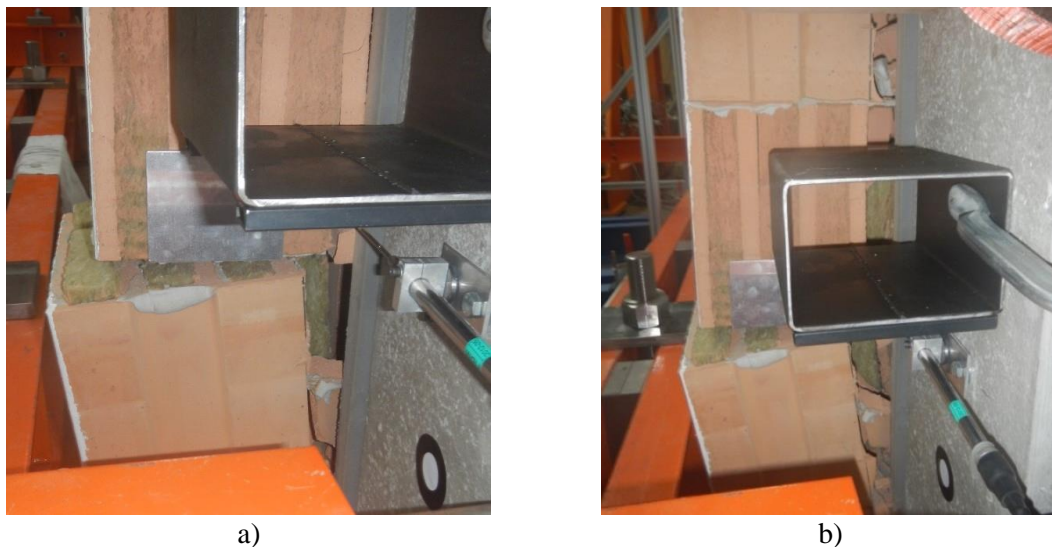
a) Complete failure of the brick in right bottom corner and b) failure of the bricks on connection with the right column
